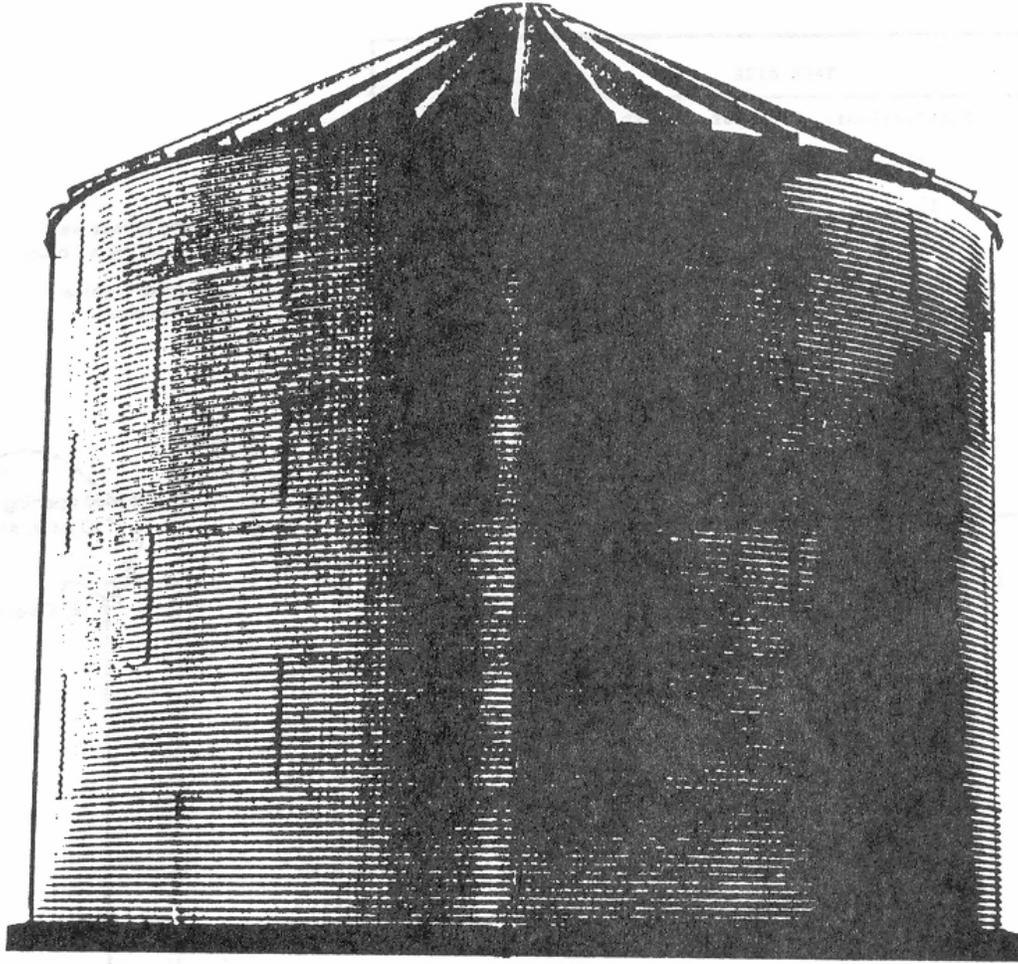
illustrates a large steel tank constructed out of corrugated structural plates.
